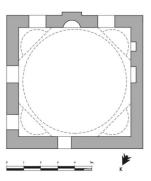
Prayer Room Plan Sığacık Inner Castle (Ertan Daş, 2007)
